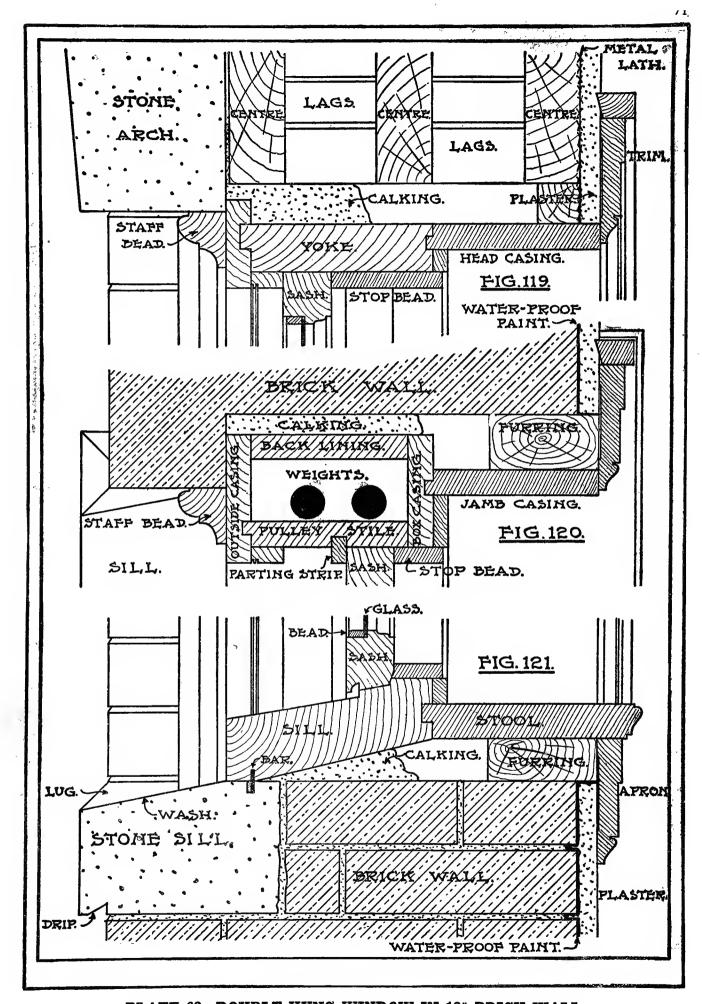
DOUBLE HUNG WINDOW IN 18" BRICK WALL
